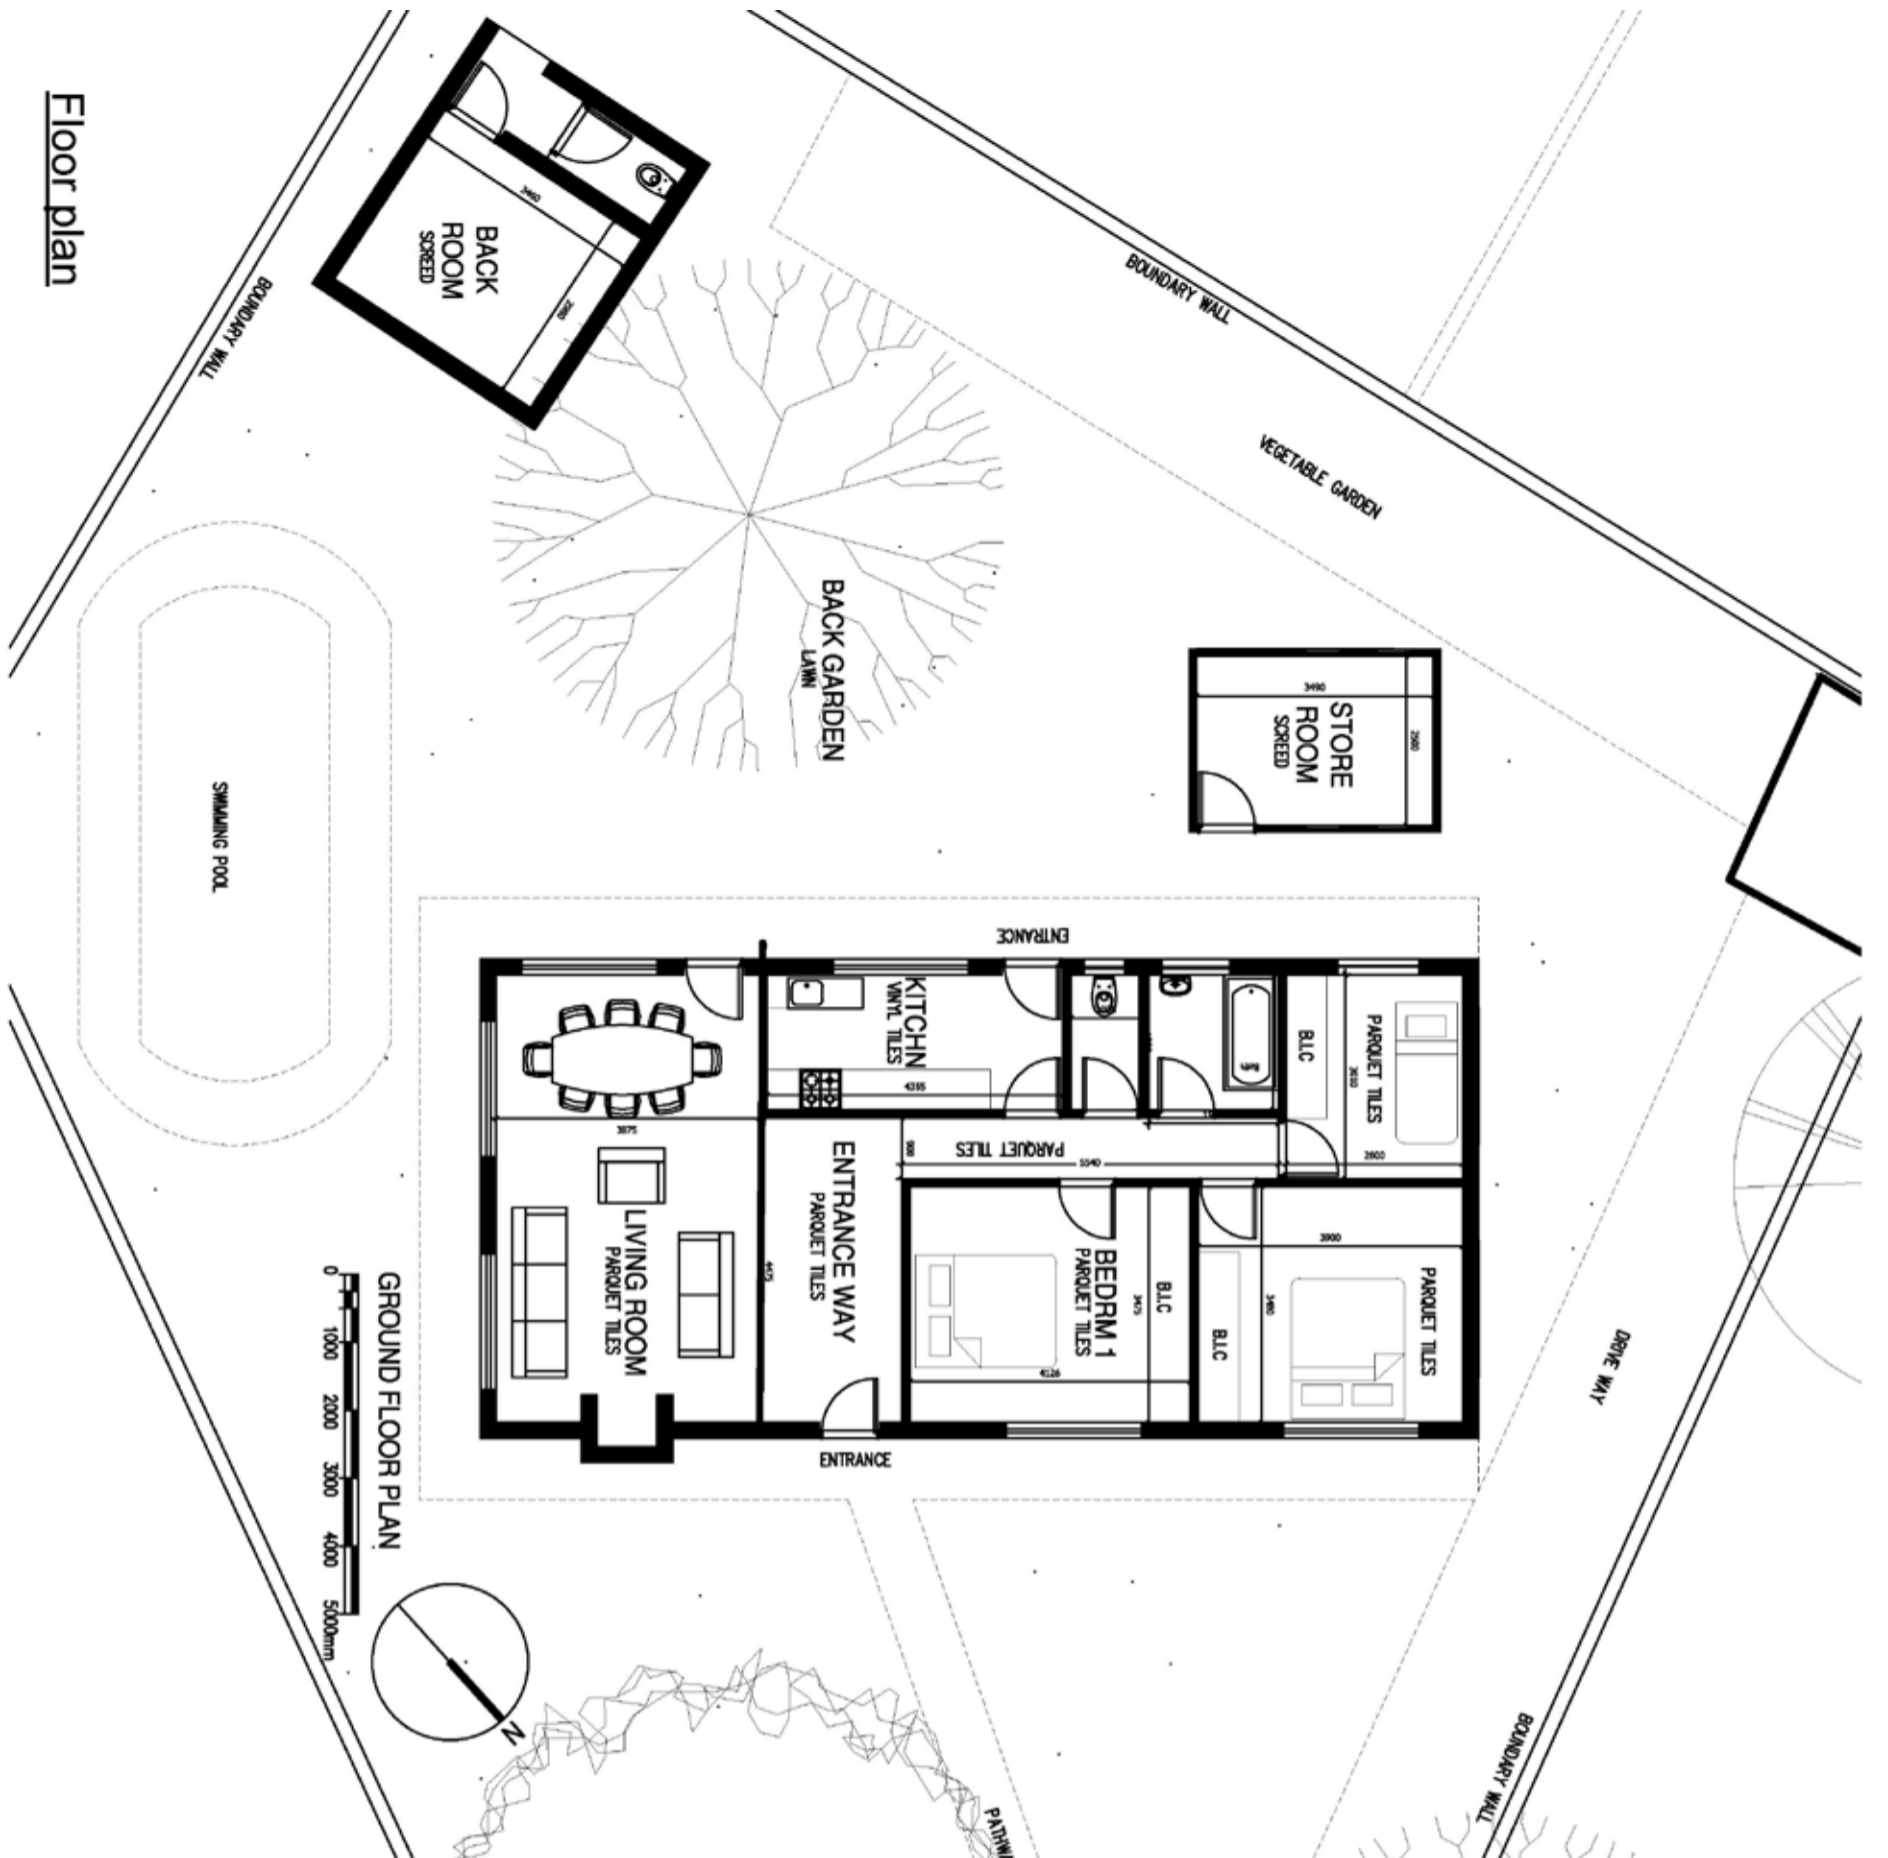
ZIM House 3 - Floor plan, site plan and context plan
